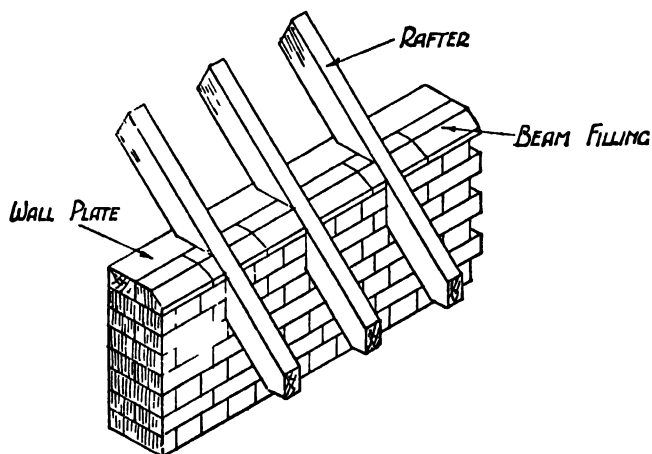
PITCHED ROOF - BEAMFILLING AT EAVES.
